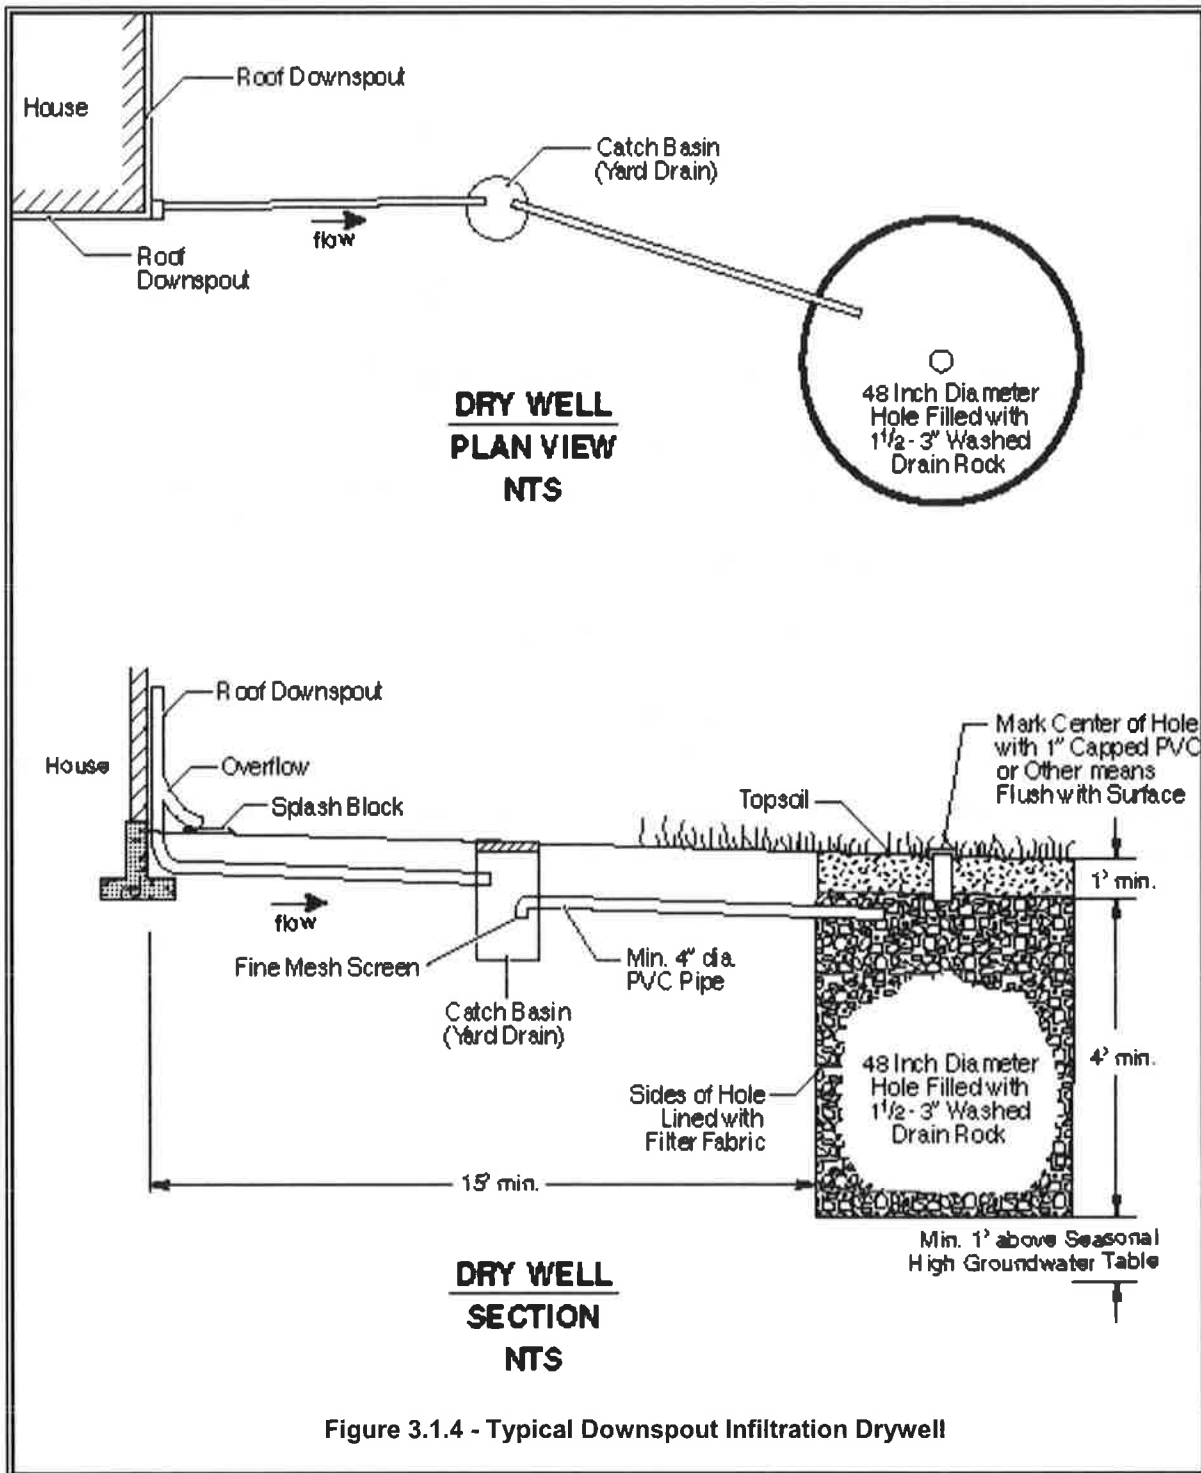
Typical Downspout Infiltration Drywell
